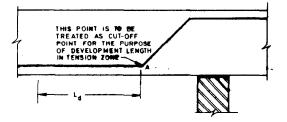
Anchoring Inclined Bent-Up Bar in Tension Zone
